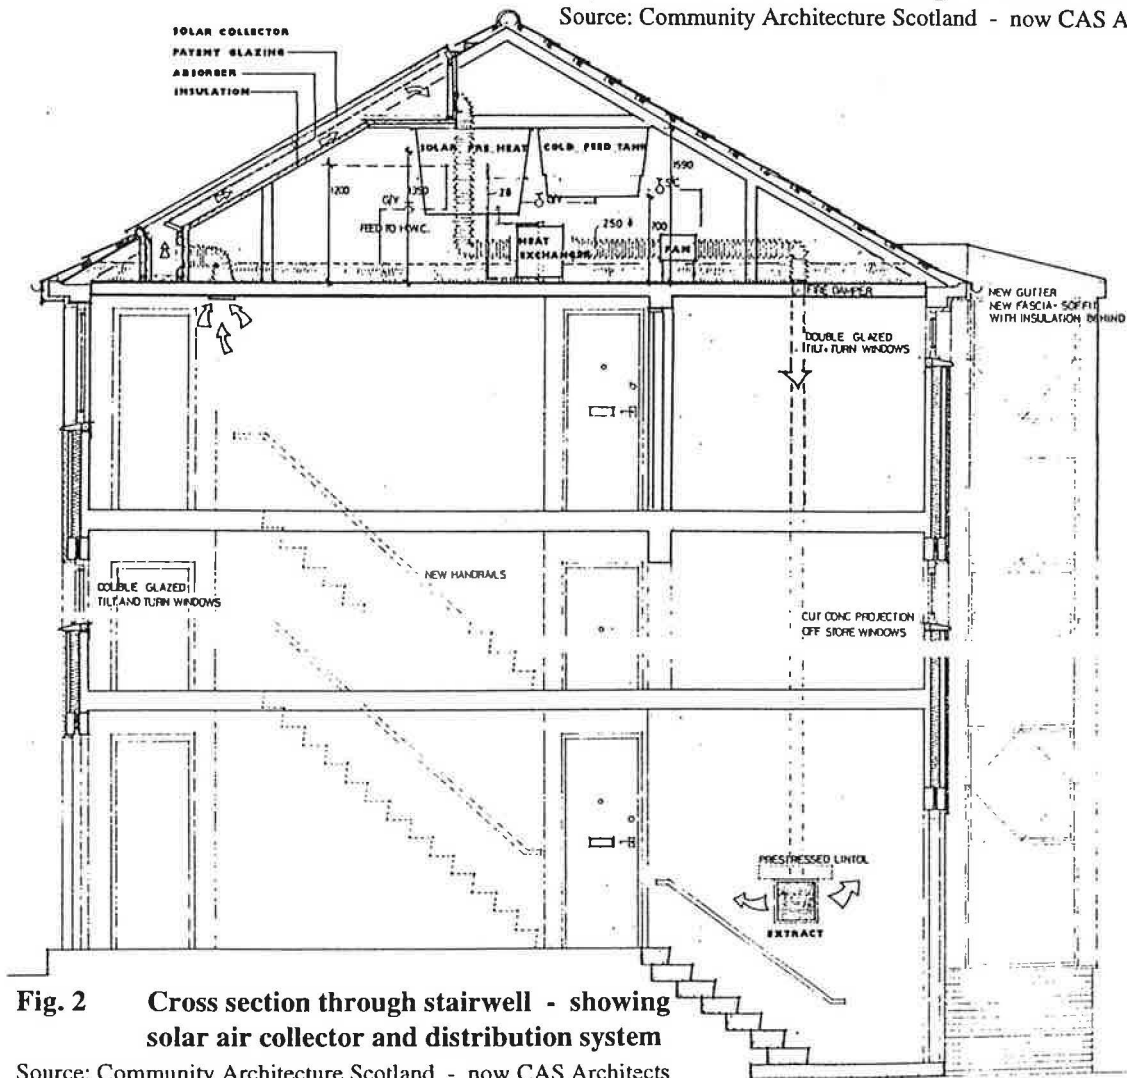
Cross section through stairwell - showing solar air collector and distribution system
